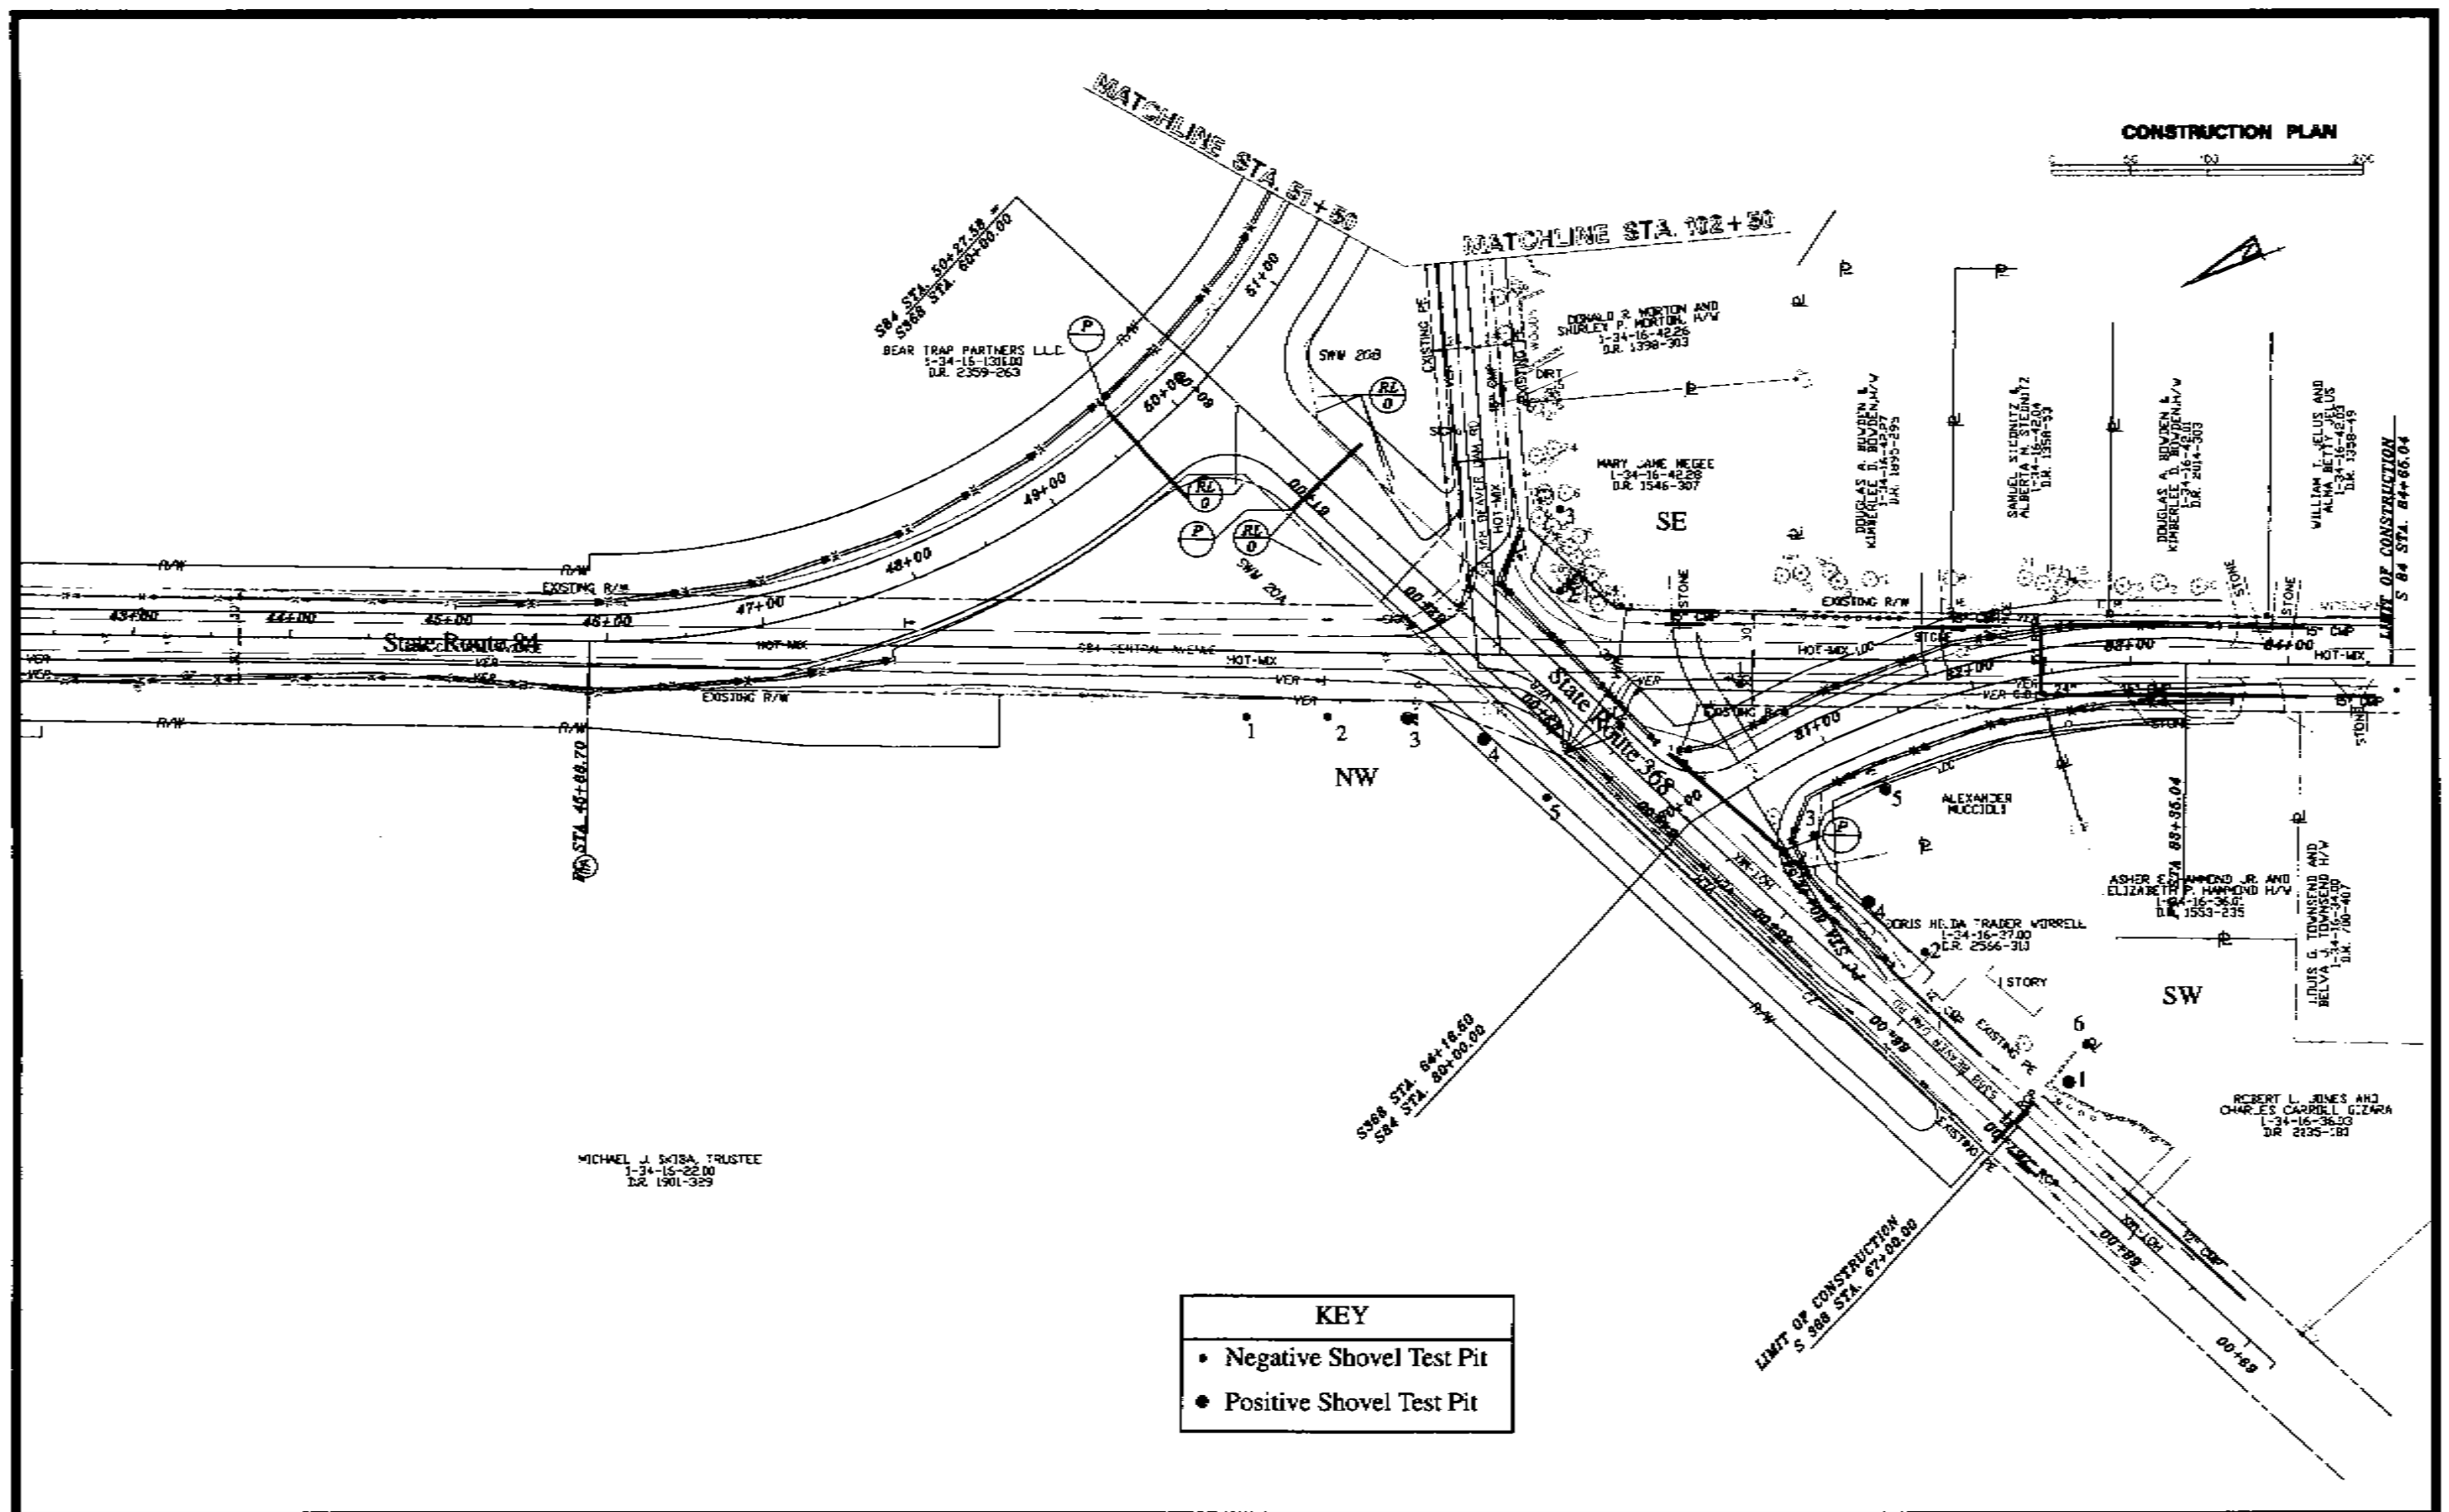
Test Area 4, Showing Locations of Shovel Test Pits.
